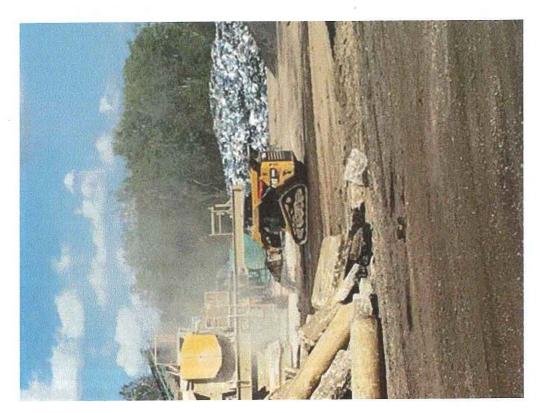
(Water Application): Water application to unpaved plant yard to control dust from moving front-end loader. Note saturated ground
